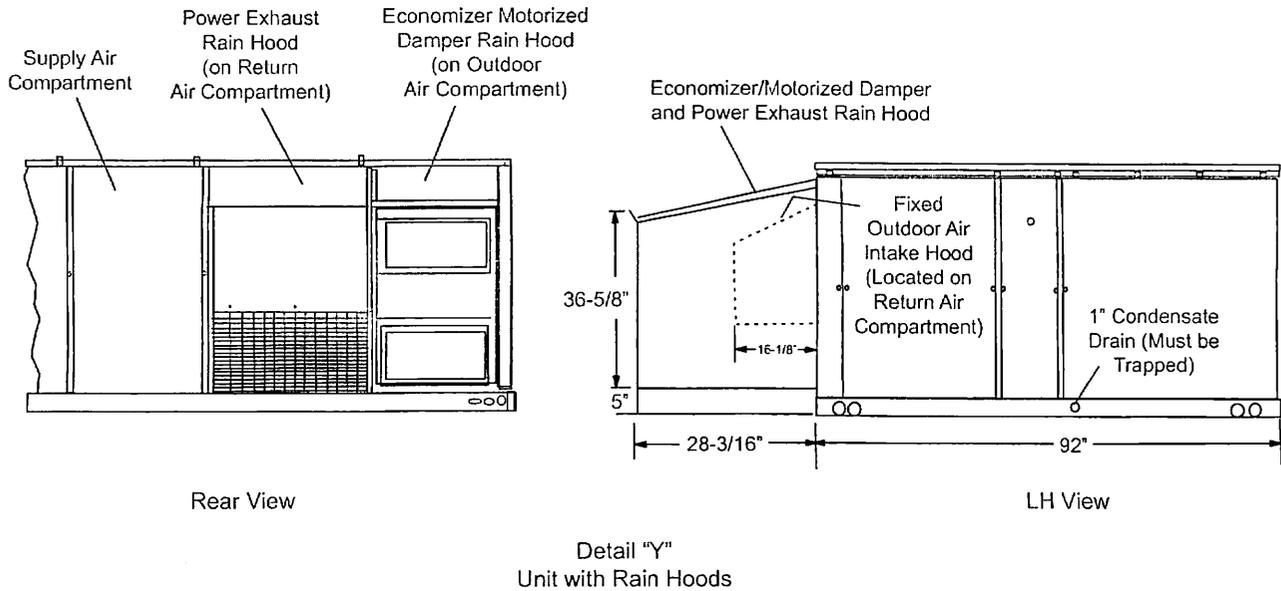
ZJ180-300 Unit Dimensions Rain Hood
